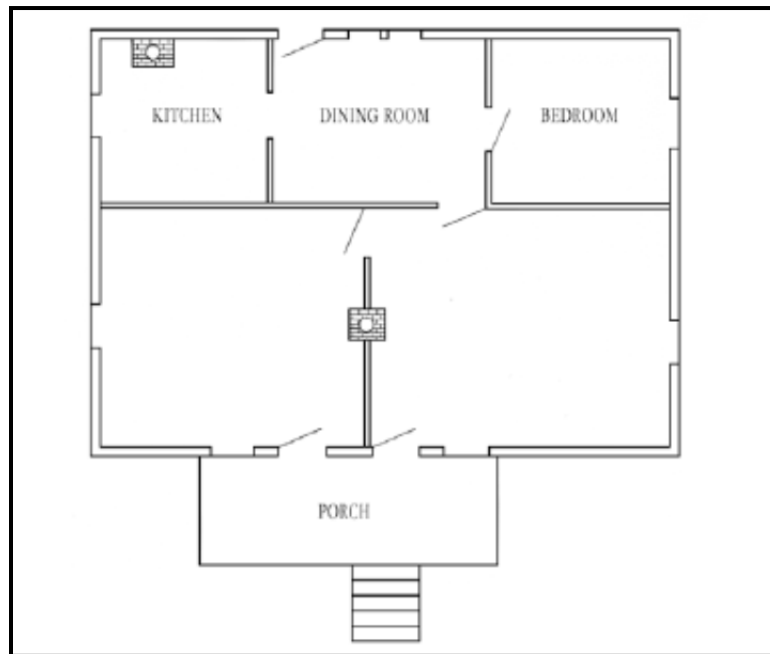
Floor plan of the Gunn House from the Normandy Reservoir Study. This is a typical Cumberland house plan, with two rooms under the main roof, and a shed addition at rear.⁴⁰
